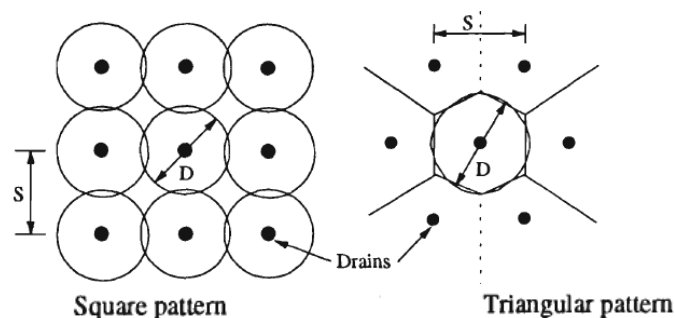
Plan view of drain pattern with its corresponding radial drainage zone (Redana 1999)
